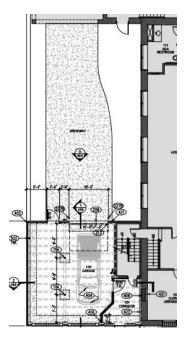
Proposed concrete driveway connecting the porte-cochère to the 1975 addition.
